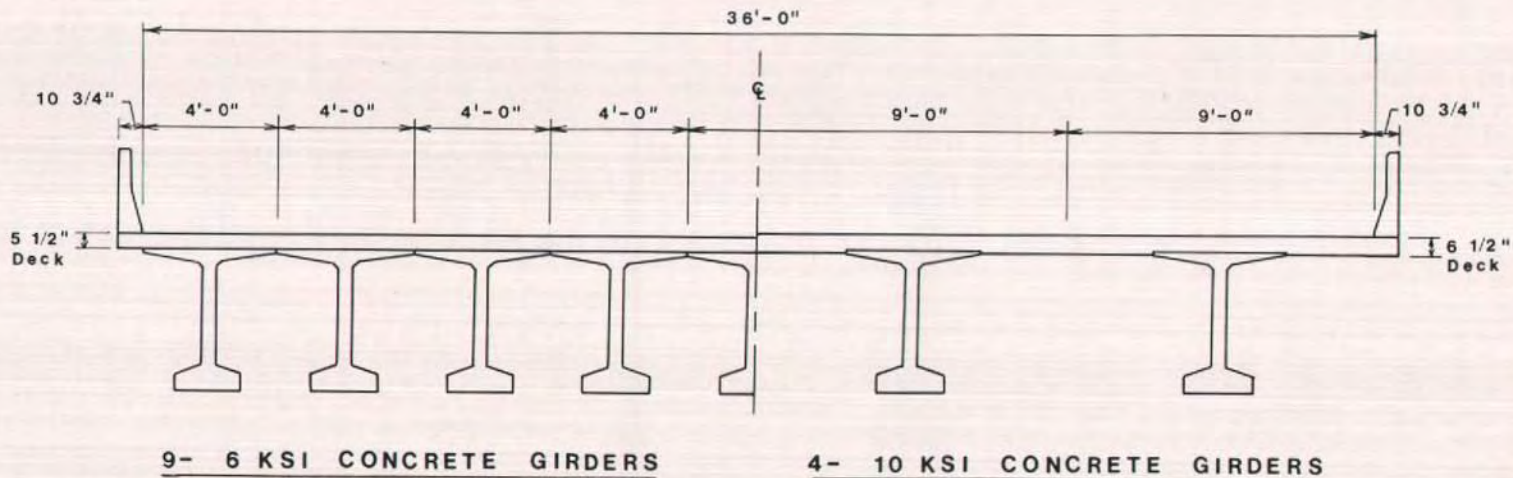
Comparison of cross section designs of a 150-ft (45.7 m) simple span bridge made possible by using alternate concrete strengths.
